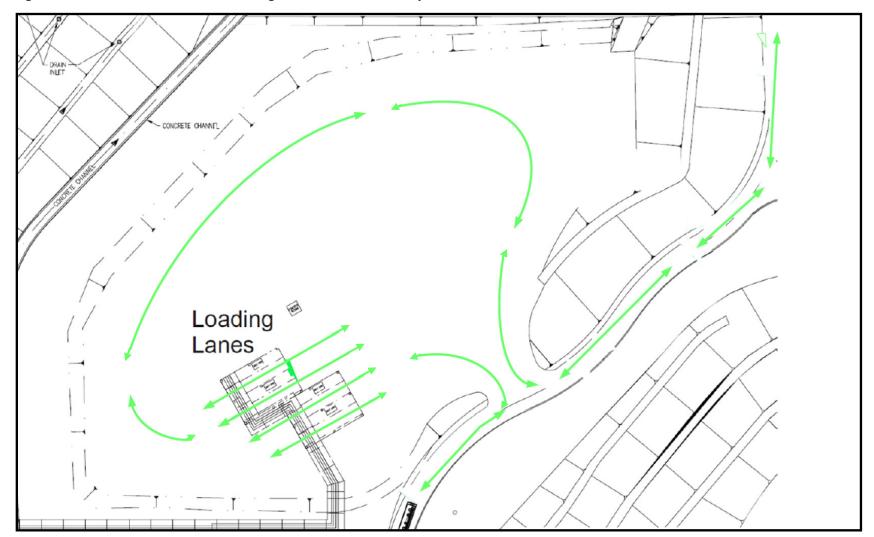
Truck Route to the Loading Racks in Las Flores Canyon
